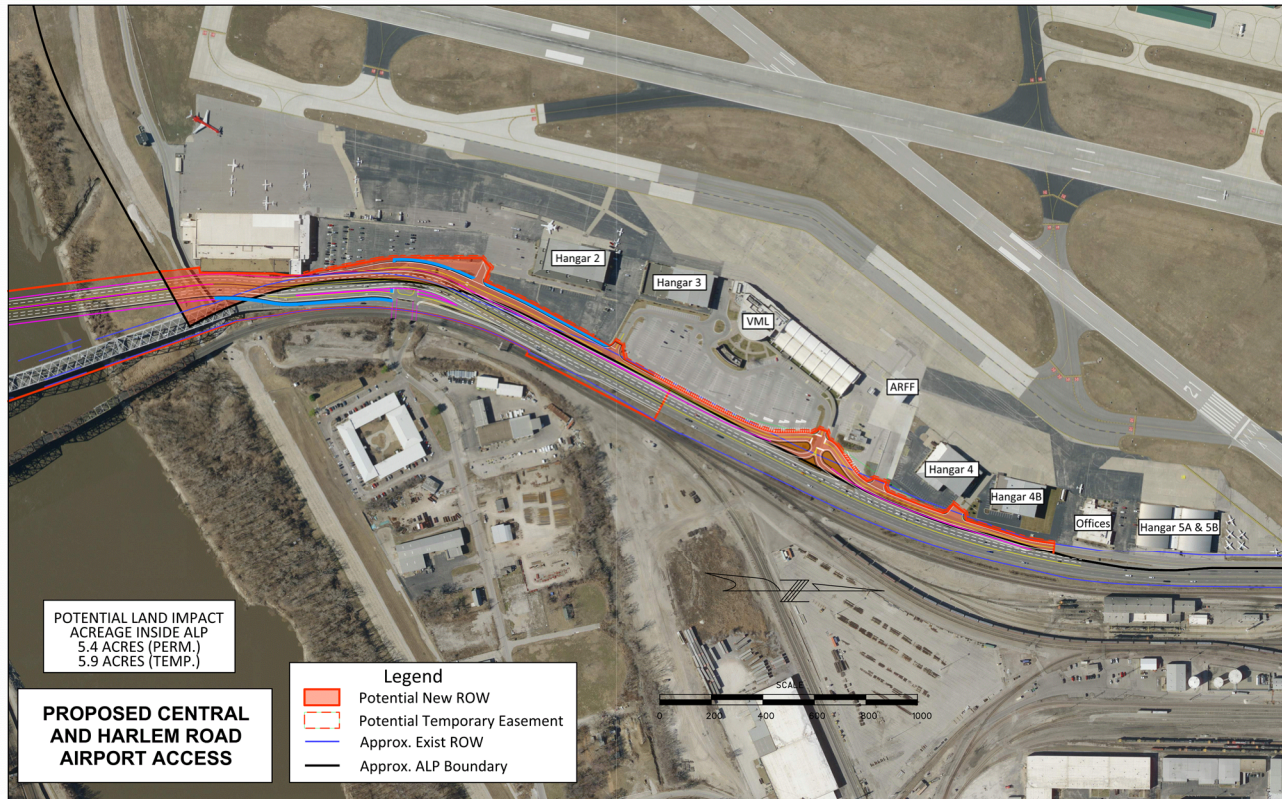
Proposed Central and Harlem Road Access Improvements
